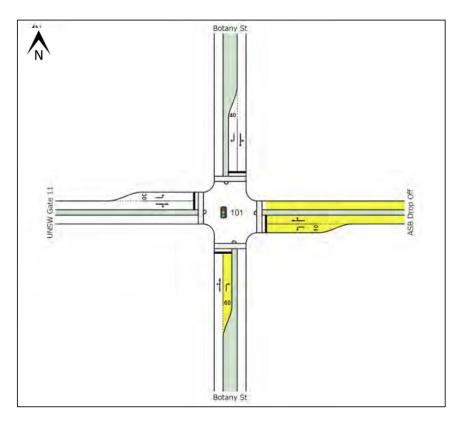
| Botany Street / UNSW / ASB intersection (Source: Applicant's EIS)
